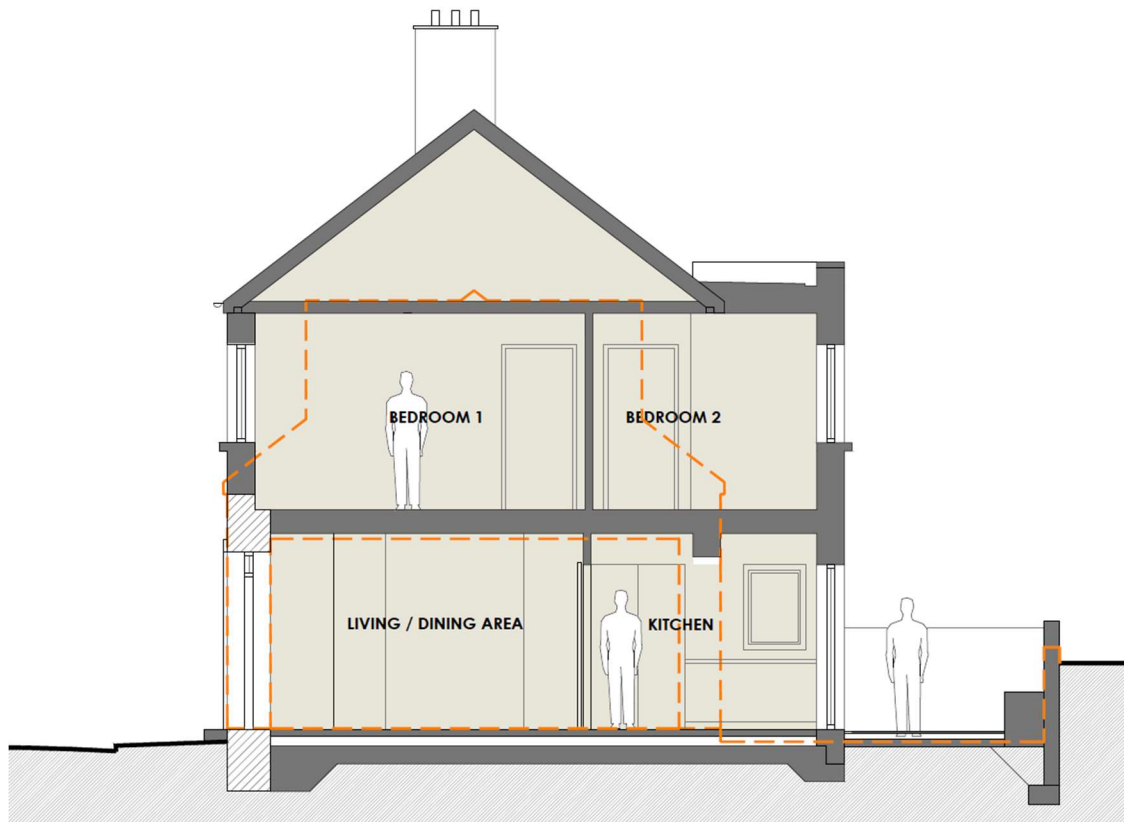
A drawing of the proposed section, illustrating the retention of the existing ground-floor façade.
